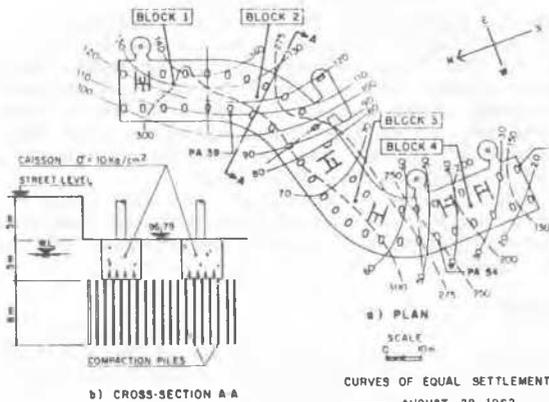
COPAN BUILDING: FOUNDATION PLAN AND CROSS-SECTION, SHOWING CURVES OF EQUAL SETTLEMENT AT END OF CONSTRUCTION (AUGS. 28, 1962) AND RECENTLY (MARCH 5, 1988)
